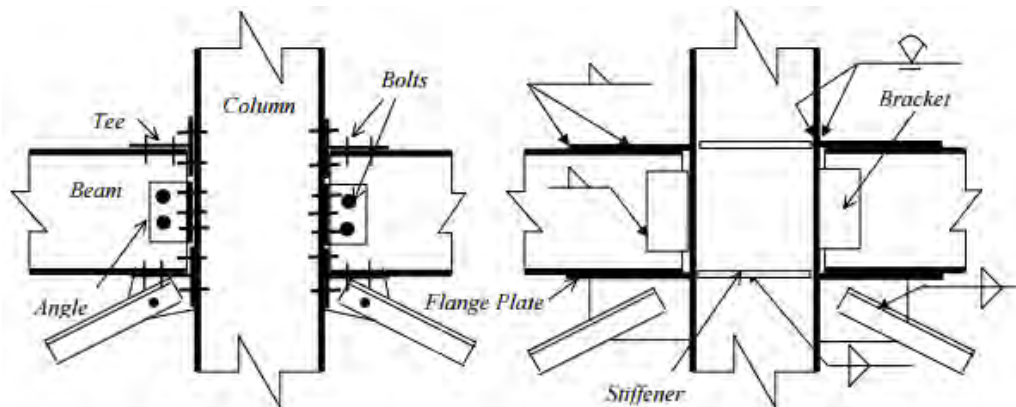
Complexity in the geometry of bolted (left) and welded (right) connections
